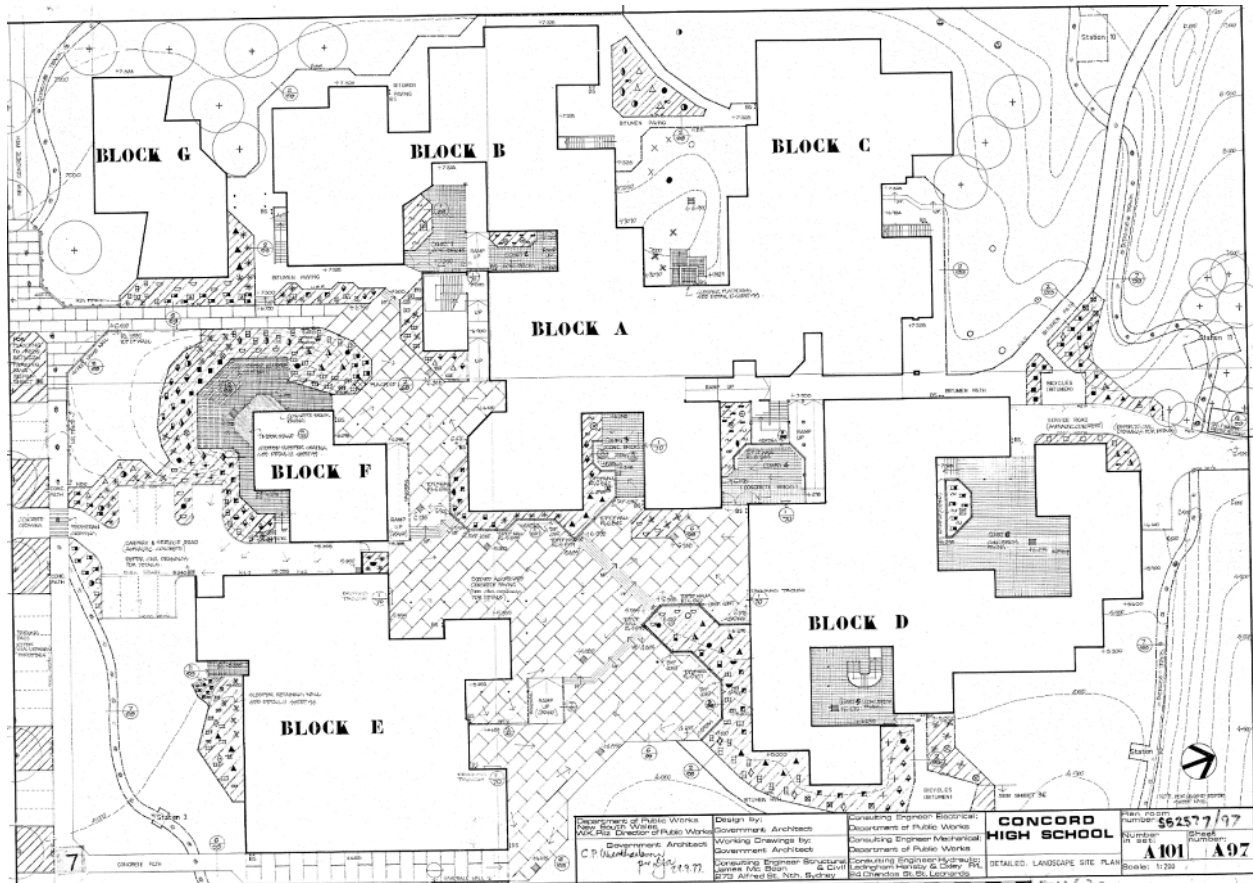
Landscaping site plan of Concord High School, c.1977. *Source:* Public Works Advisory plan room, SB2577_97.
